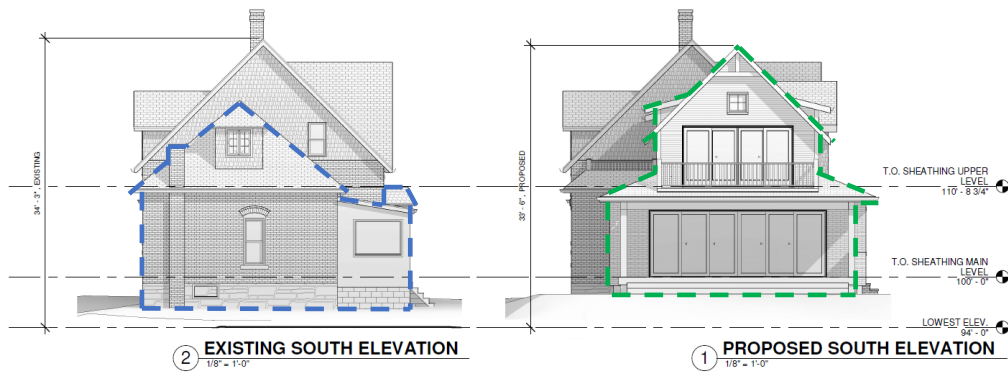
Existing left (area to be demolished in blue) and proposed right (new construction in green) south elevation
